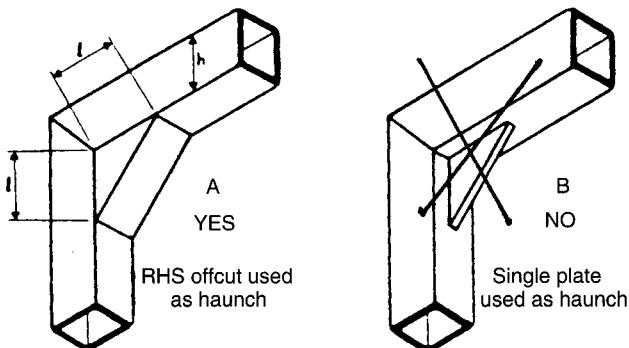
Reinforcement of knee joint with RHS offcut as haunch
